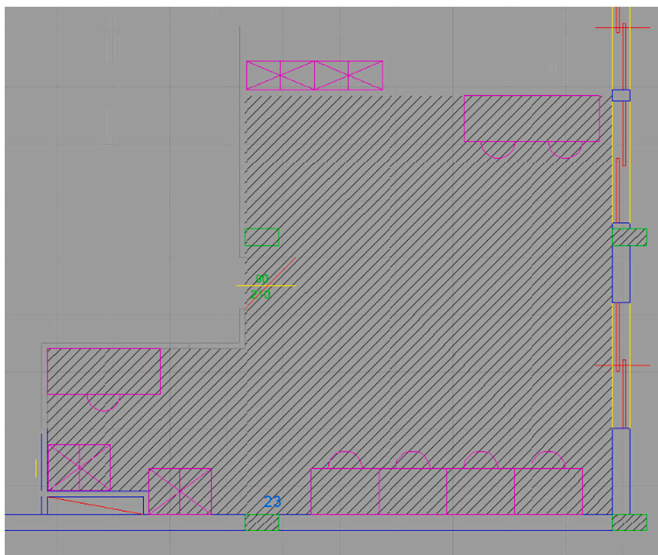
CAD model of the robotics lab before being re-purposed for VISTA final tests.
